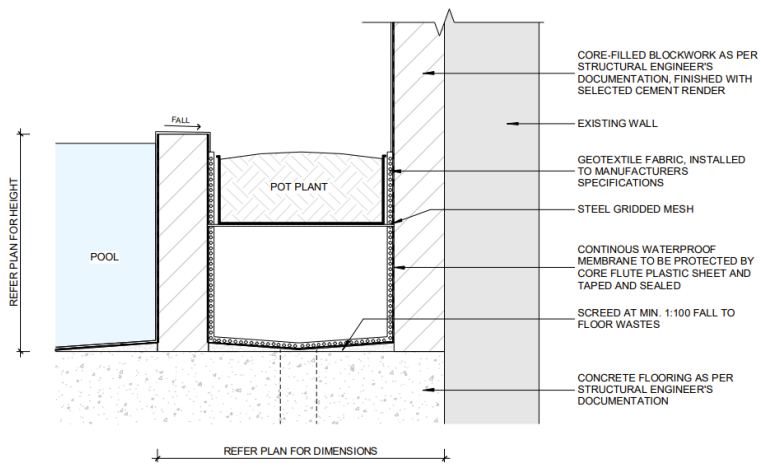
Detail of plan showing interface between pool and existing wall. Source: Embrace Architects, 2026.
